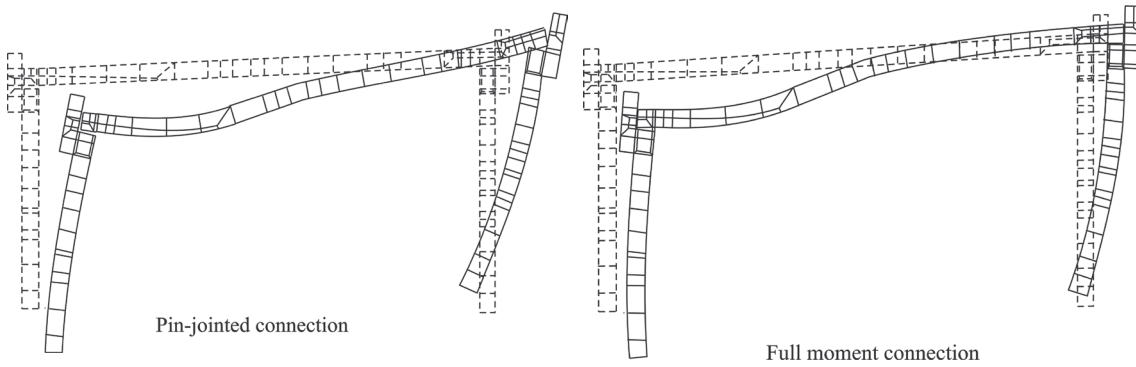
Displaced shape of walls and slab following completion of excavation
